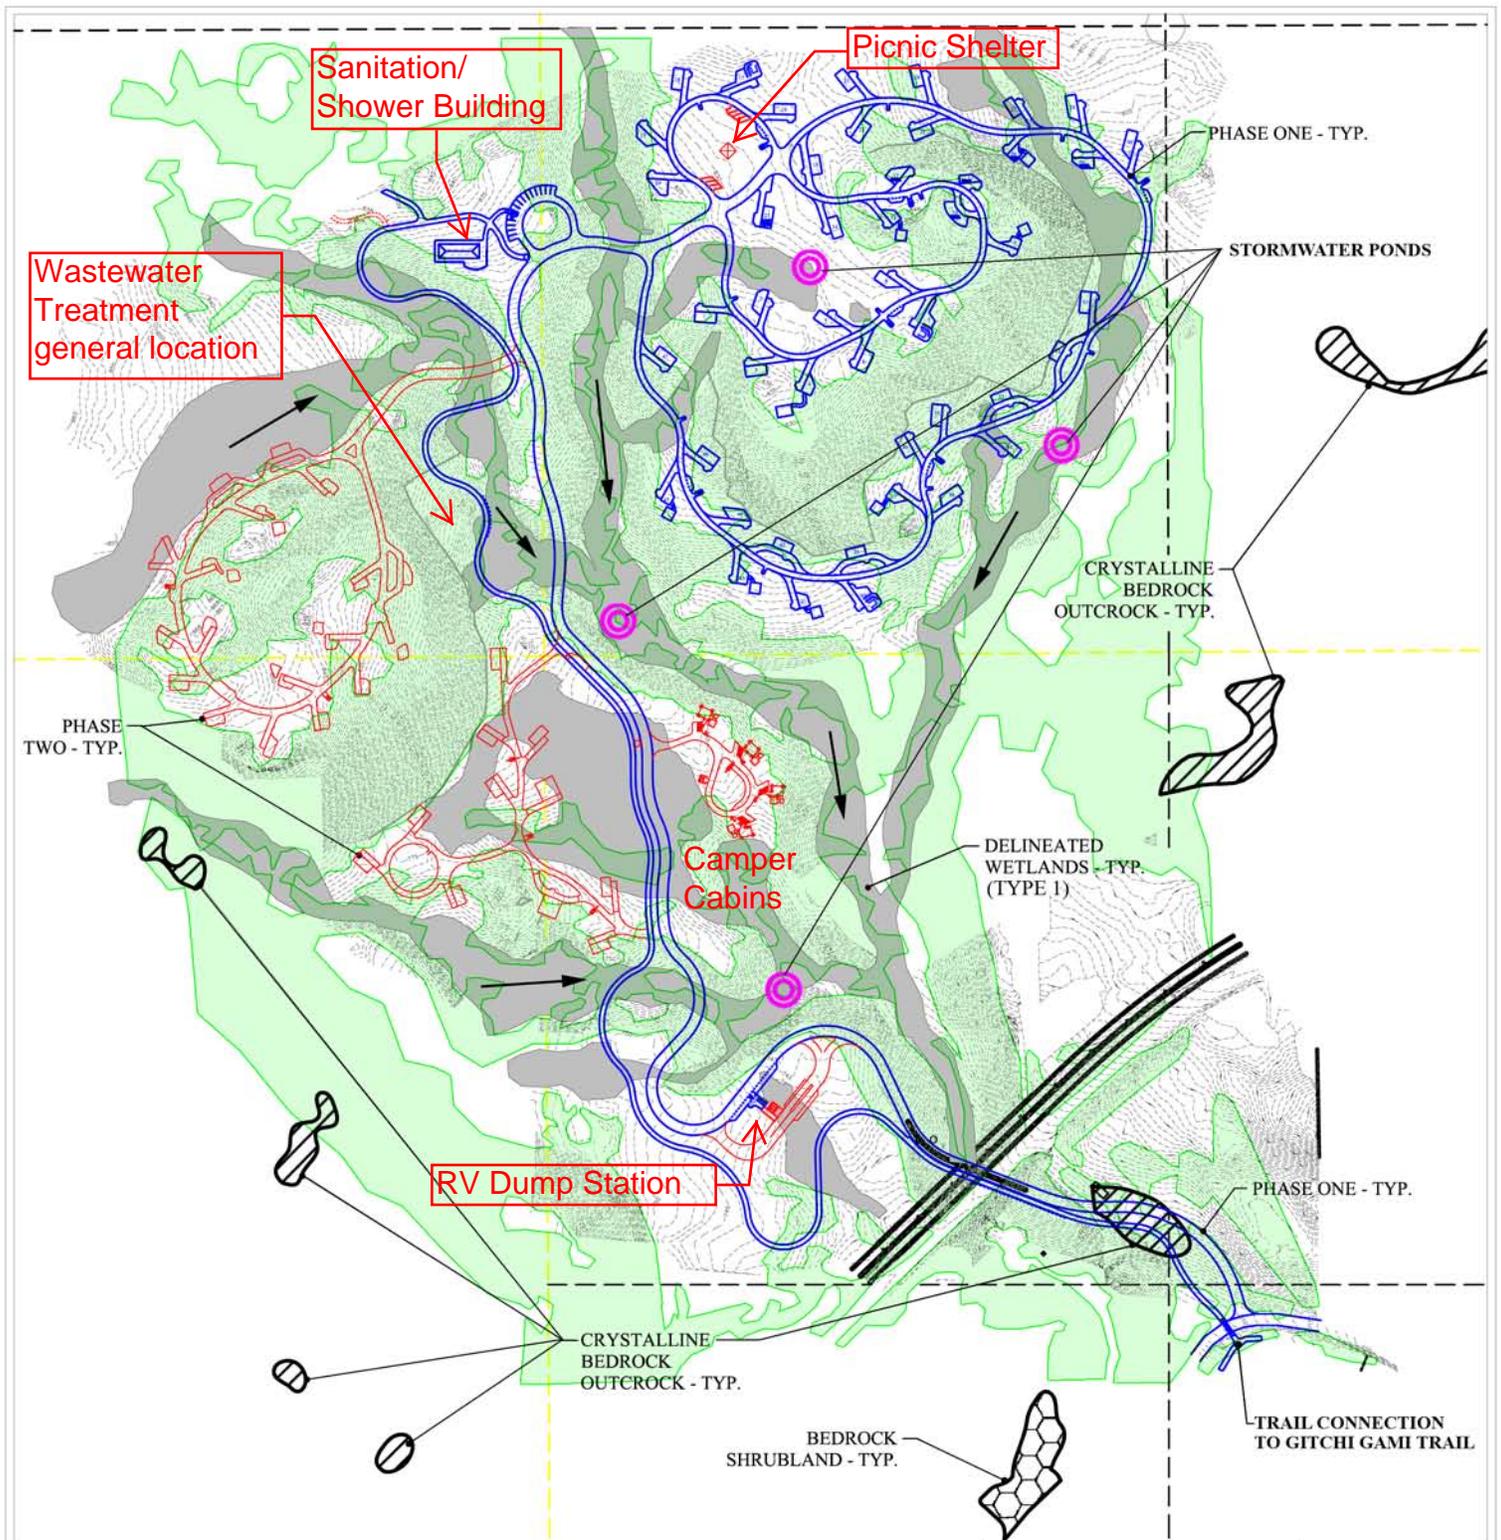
Split Rock Lighthouse State Park Campground Expansion - Proposed Development
